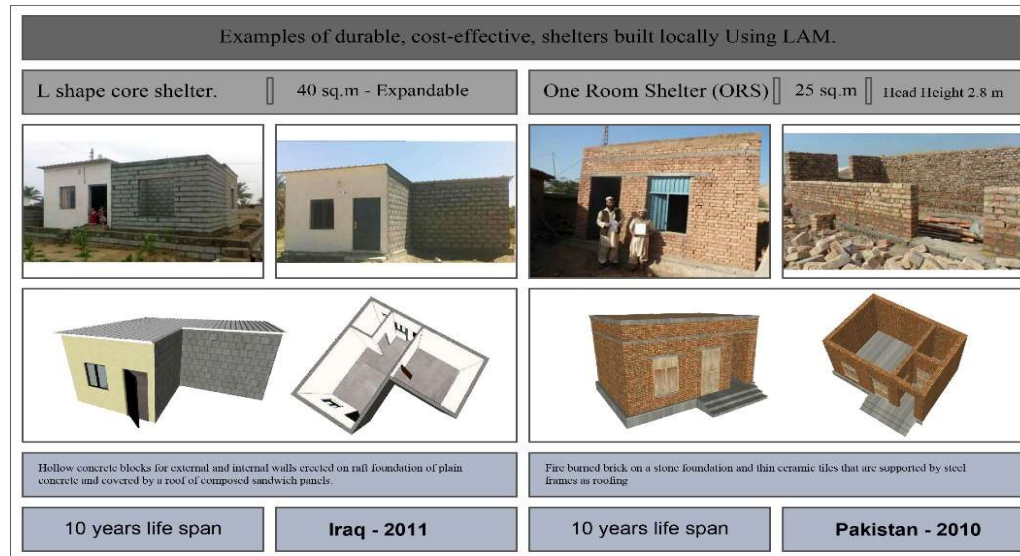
Examples of durable Locally built shelters with LAM, Collected by the Author from (UNHCR, 2016)
